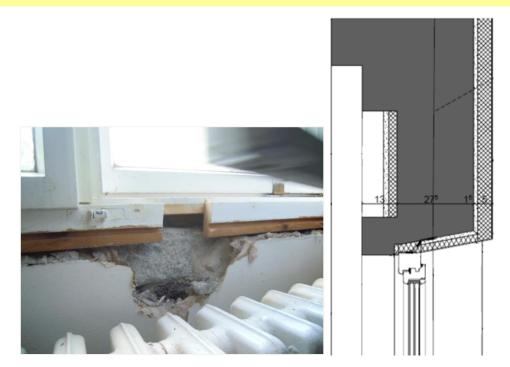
Hygrothermally critical window connections; left: continuous natural stone window sill from the outside to the inside, right: low wall thickness with additional cross-sectional weakening in the lintel plane.
